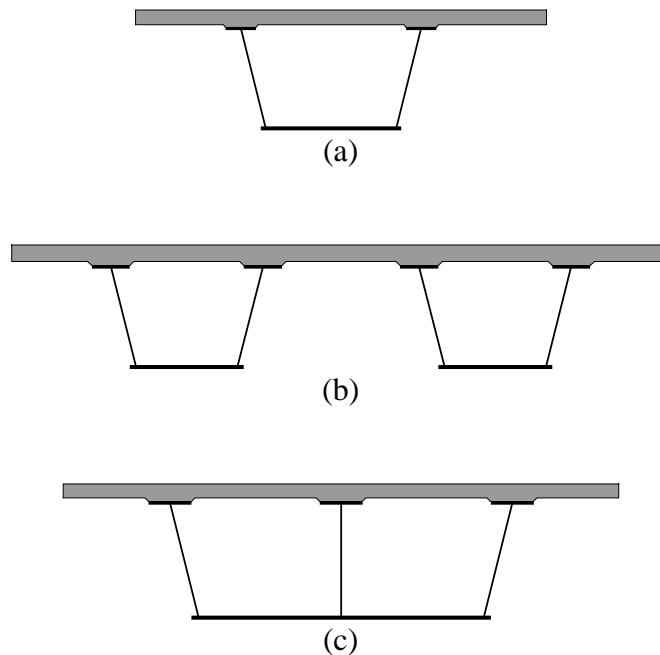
Steel/concrete composite box girders: (a) Single box; (b) Multi-box (twin-box); (c) Multi-cellular box
